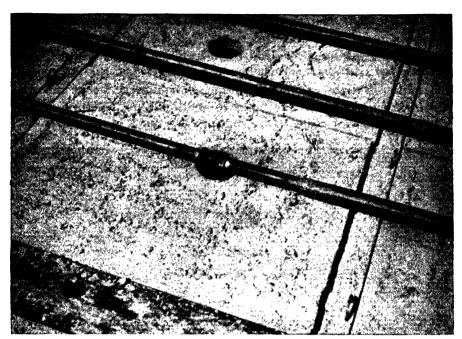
Wrought-iron pipe coils laid on prefabricated floor slab. (A. M. Byers Company.)
